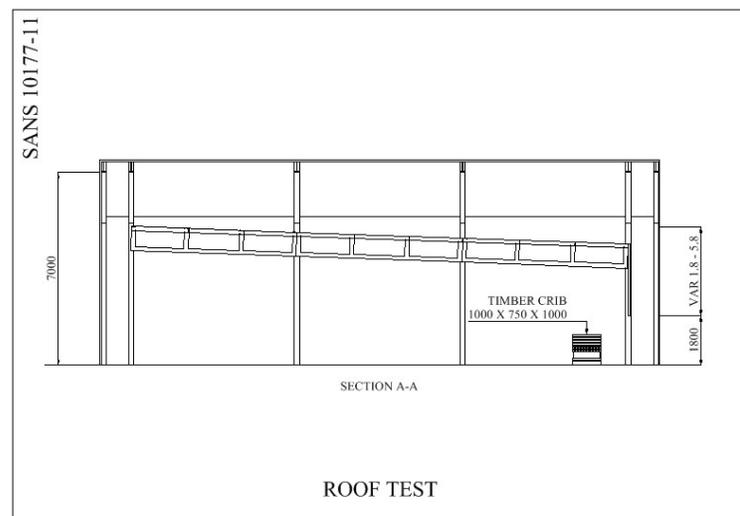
Typical roof test installation in the SANS 10177 Part 11 facility
